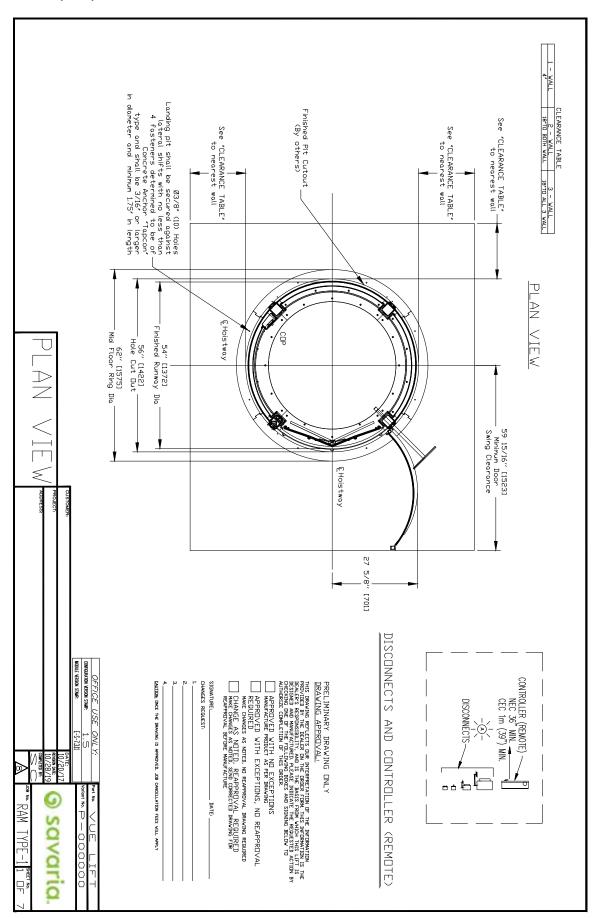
Pit/bottom floor/thru-floor view (RAM)
